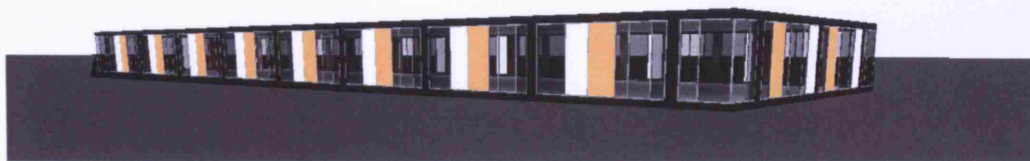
6: Exterior view of the south facade of the proposed building of the 2_90 case
